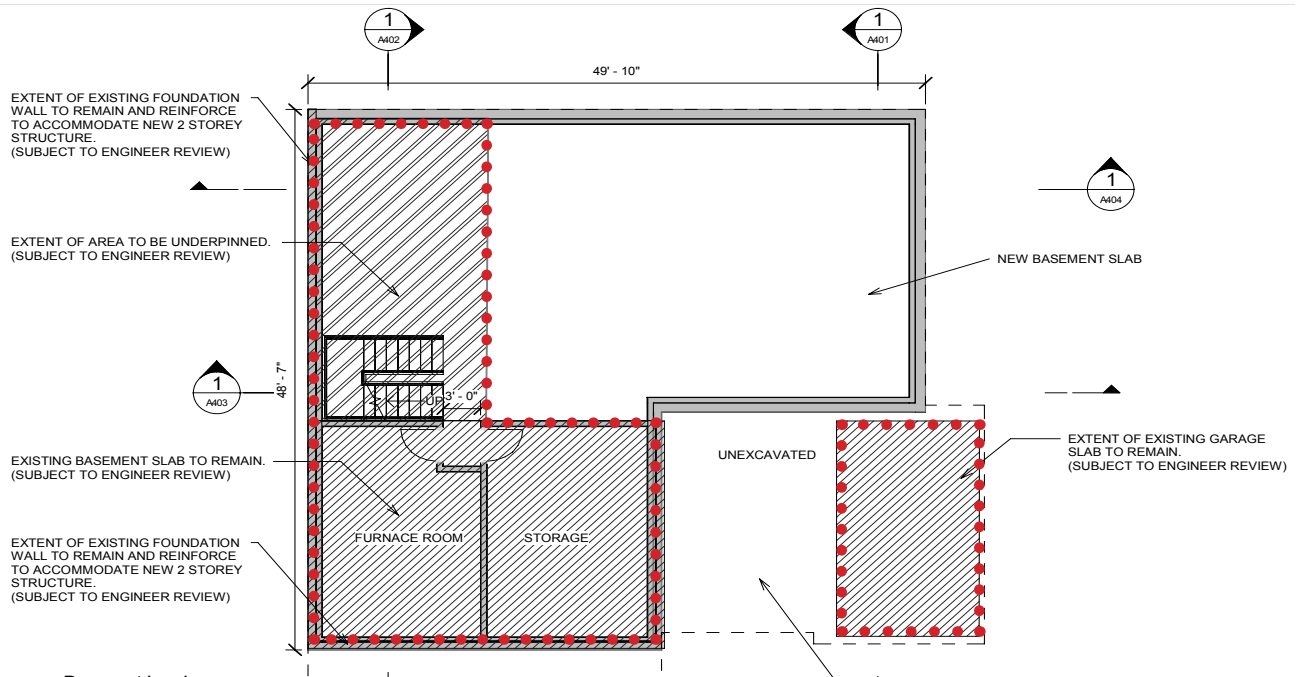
Basement/Lower Level Floor Plan. Red dotted lines indicate existing footprint foundations to remain as part of proposed addition/renovation. Drawing by Third Layer Architects, 2021.
